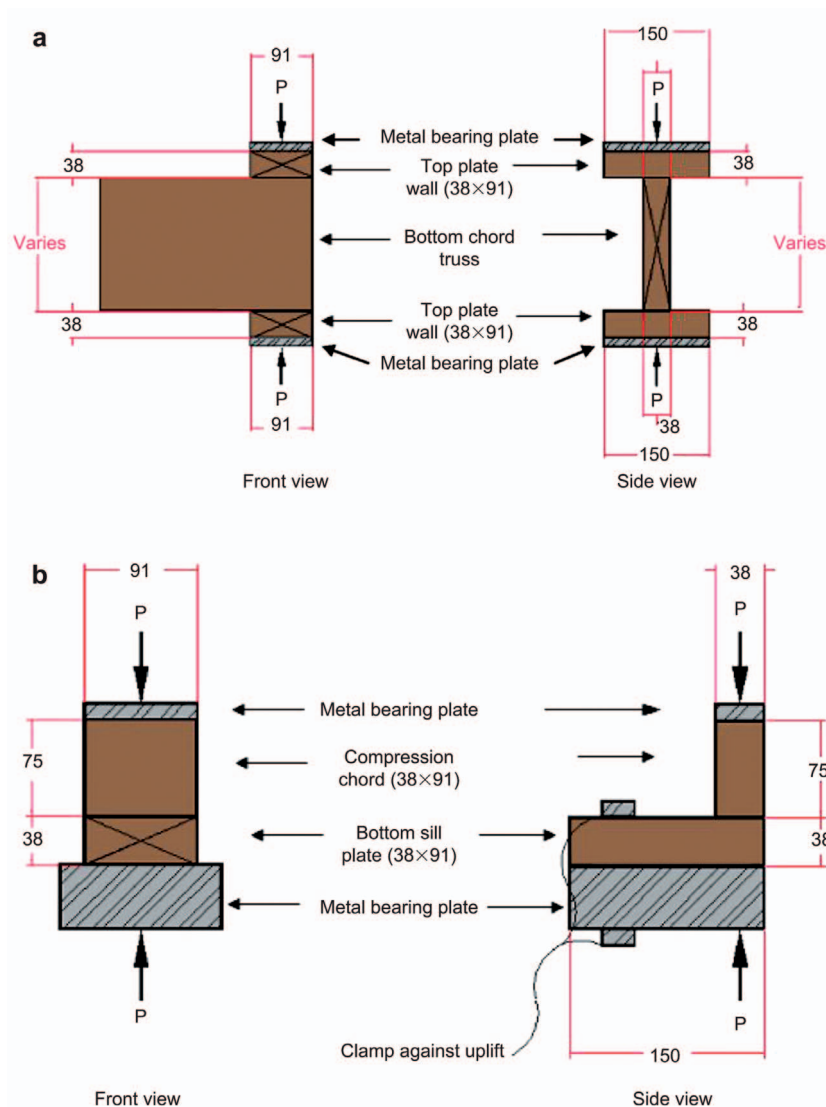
Schematics of the assemblies tested (a) BC assembly, truss bottom chord on wall top plate and (b) BP assembly, compression chord bearing on bottom plate of wall.
